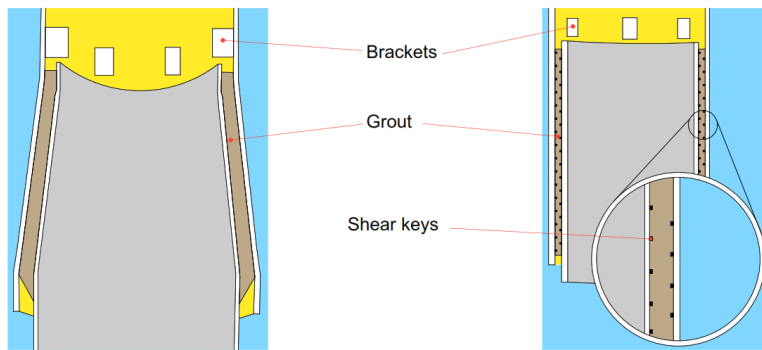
Conical grouted joint (left) and shear-keyed cylindrical grouted joint.
